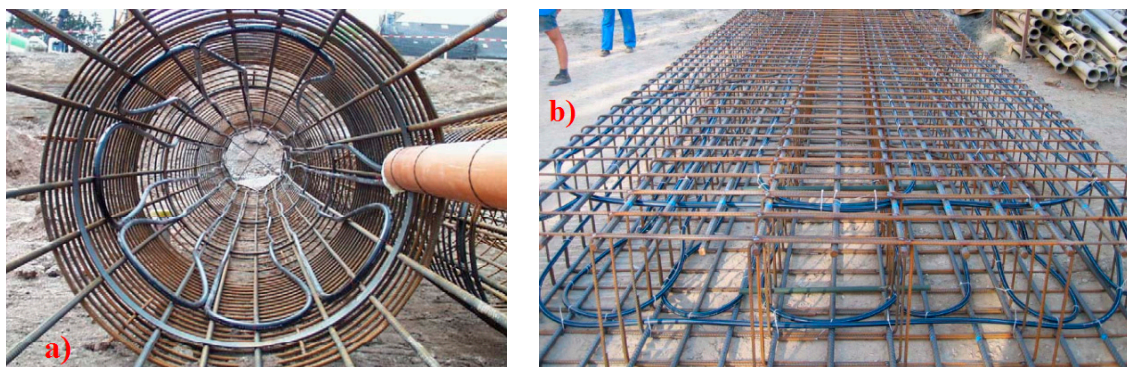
An example of an energy pile, (a) the interior of the pile reinforcement with arranged pipes [53], (b) pipe arrangement in a reinforcing structure (slurry wall) [54].
